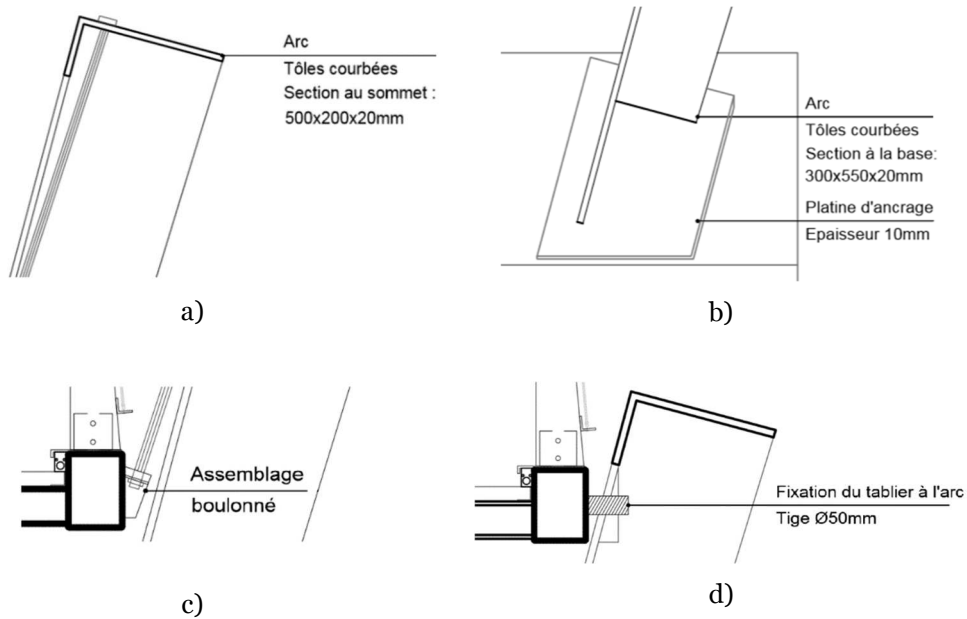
Some details of the structure: a) arch top section; b) arch base section; c) connection between suspension cables and deck; d) connection between arch and deck.
